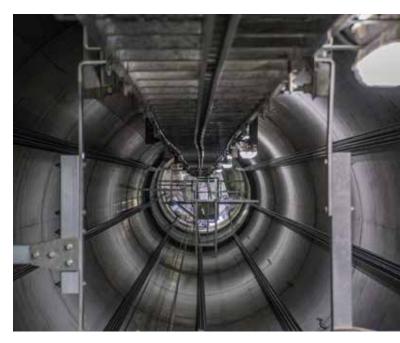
Nineteen-strand external tendons around perimeter of tower.
